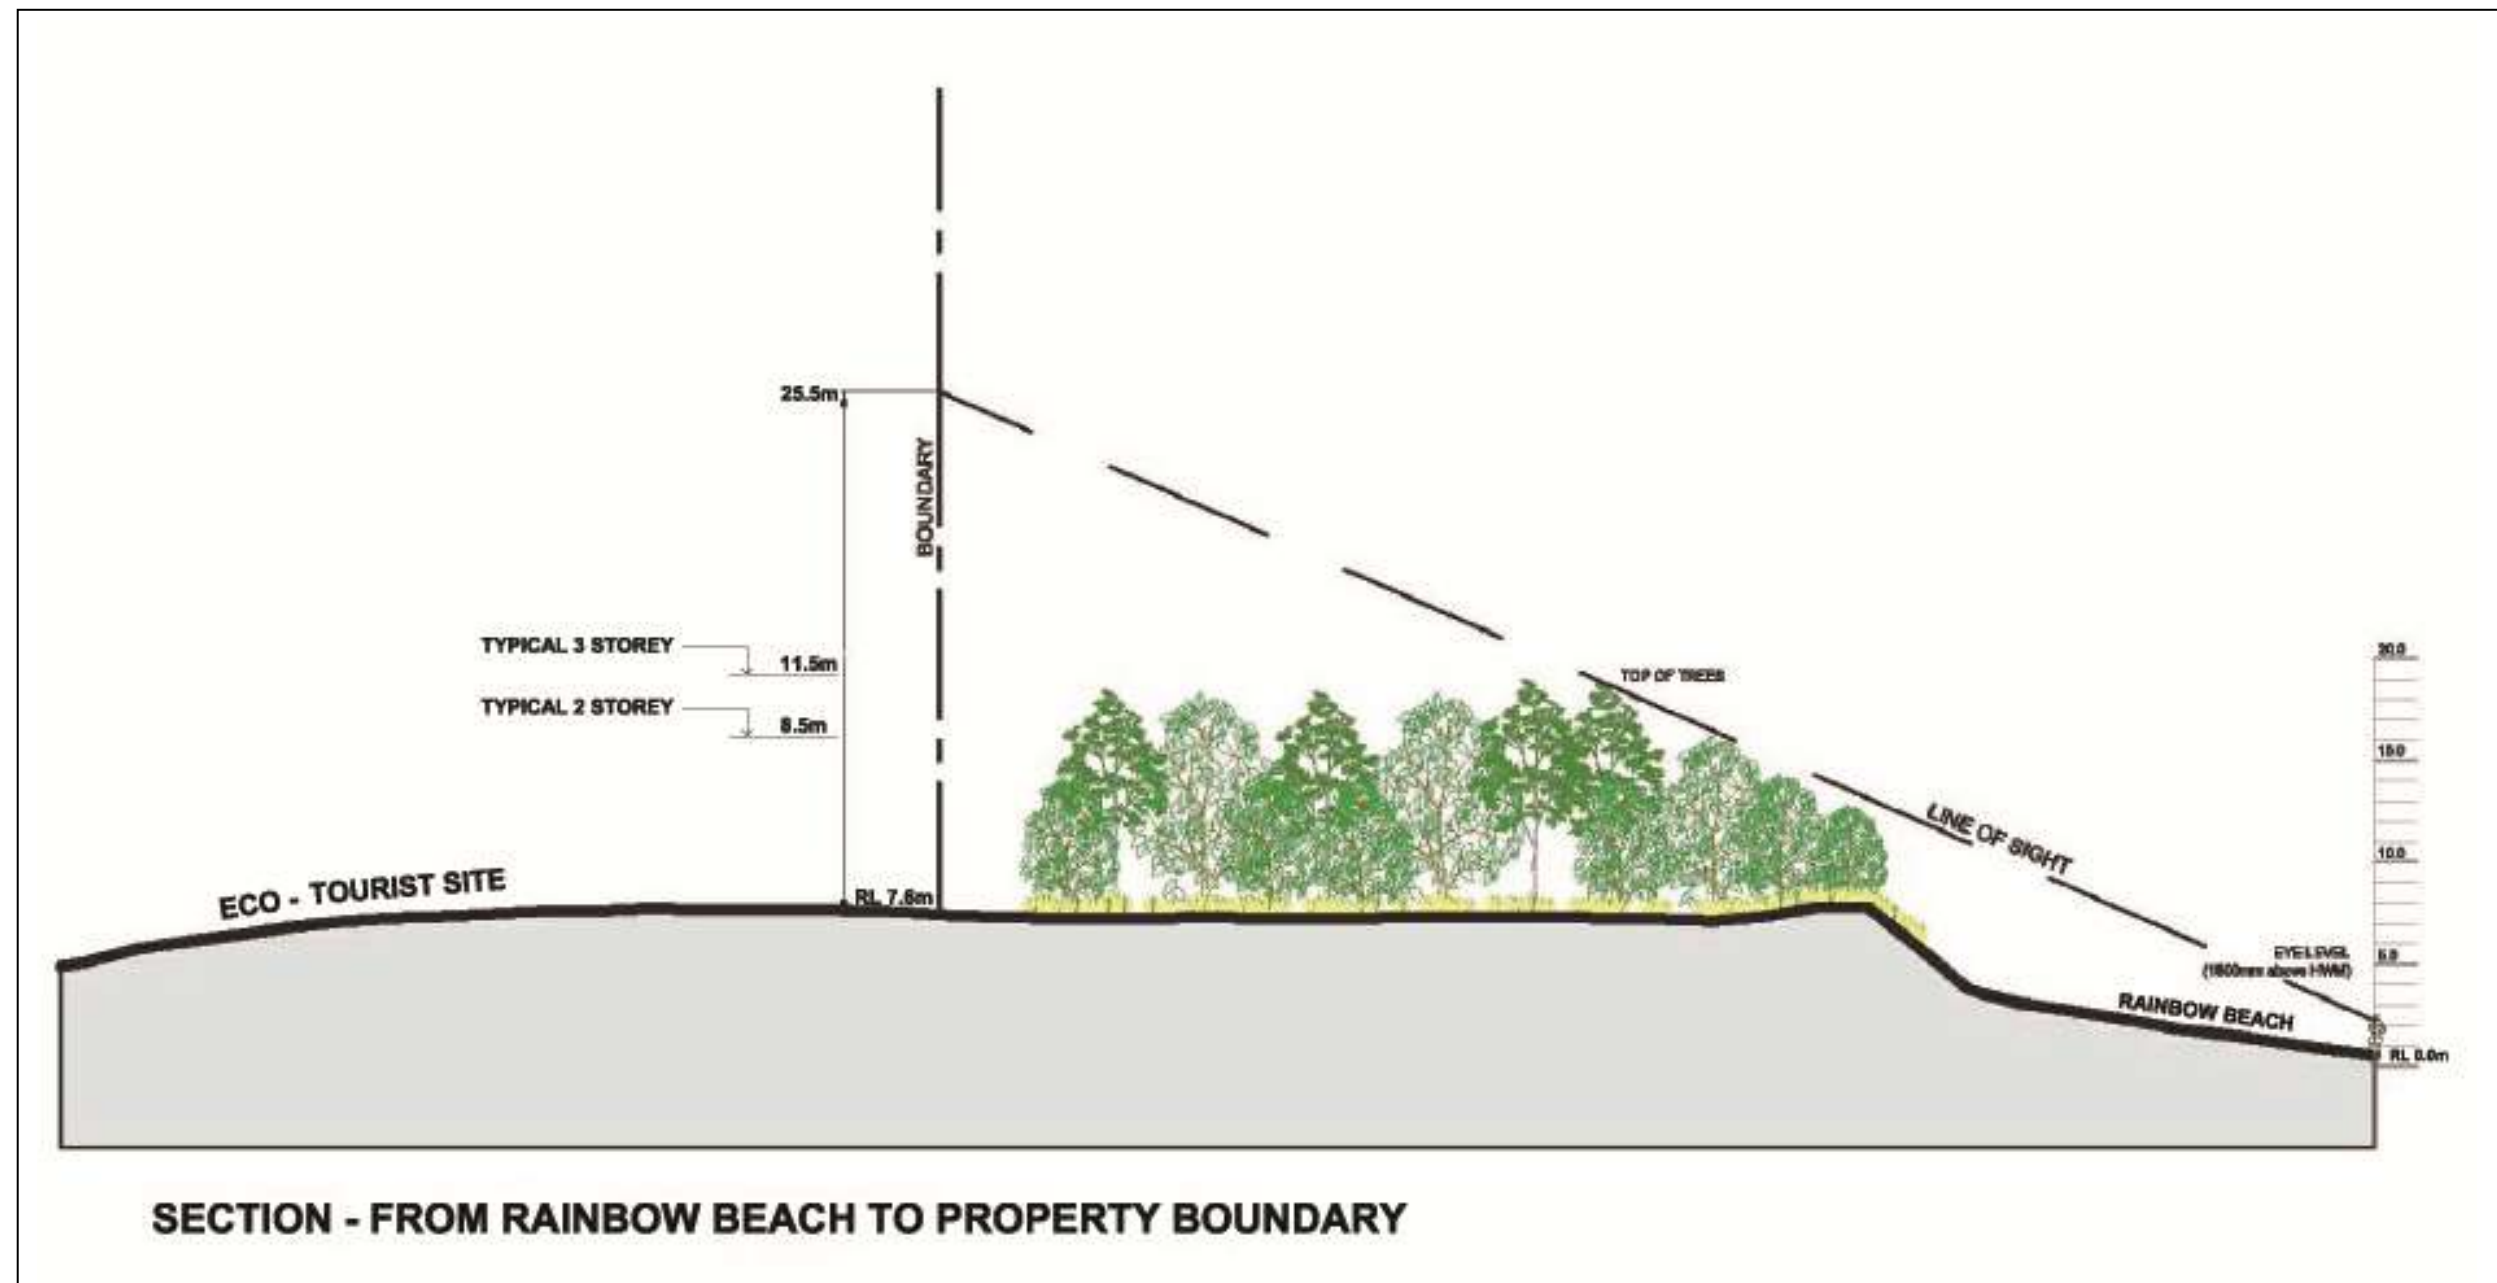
demonstrates that a building to 25.5 metres in height on the Eco-Tourist site would not be visible to a pedestrian on Rainbow Beach. This height is of course well in excess of a two or even three storey building, which is also shown in the diagram.
